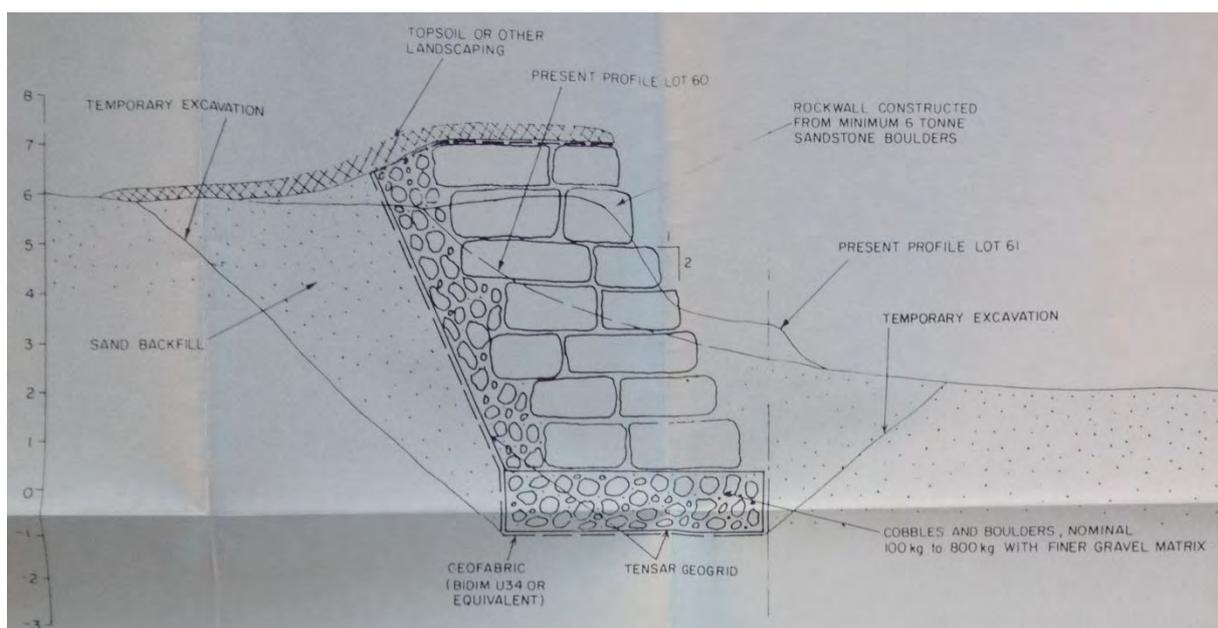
As-constructed drawing of seawall at 11 Surfview Road
